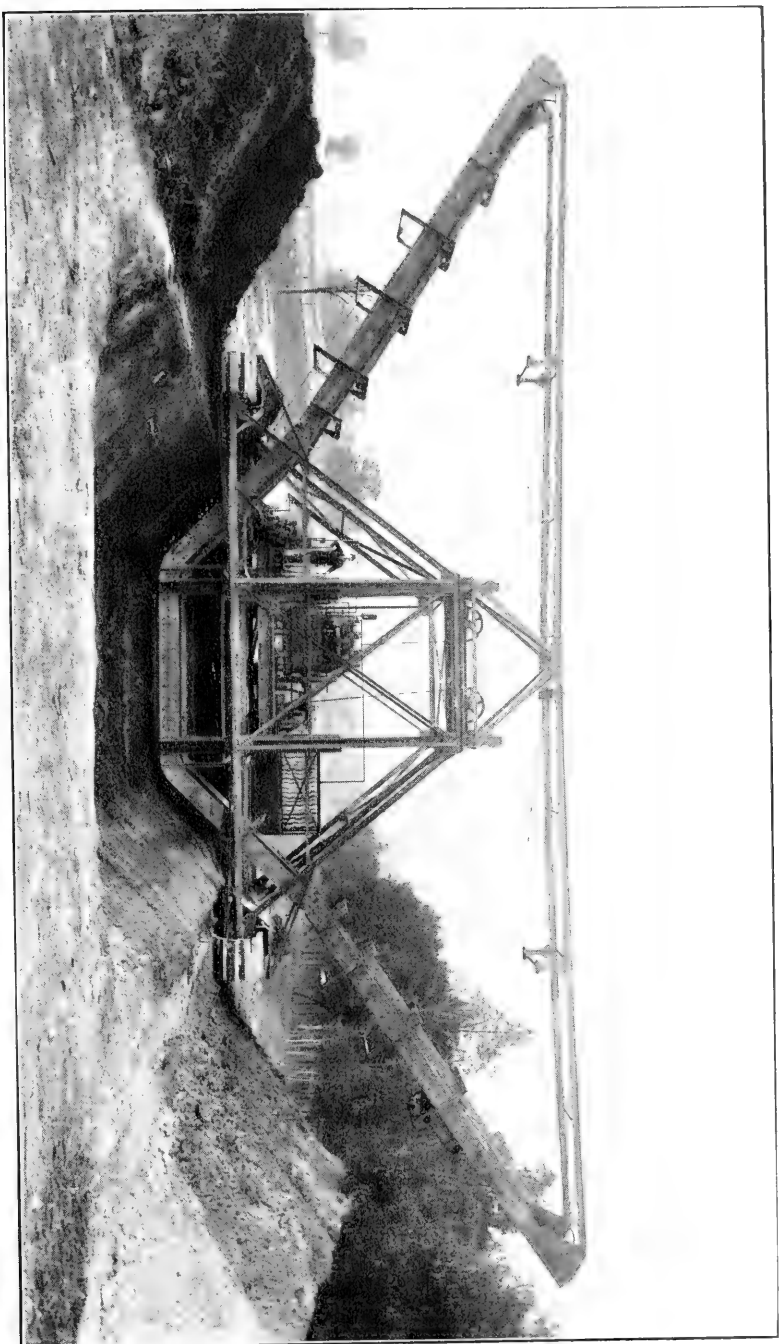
A Dry Land Dredge or Excavator Constructing a Wide Bottom Drainage Ditch.
